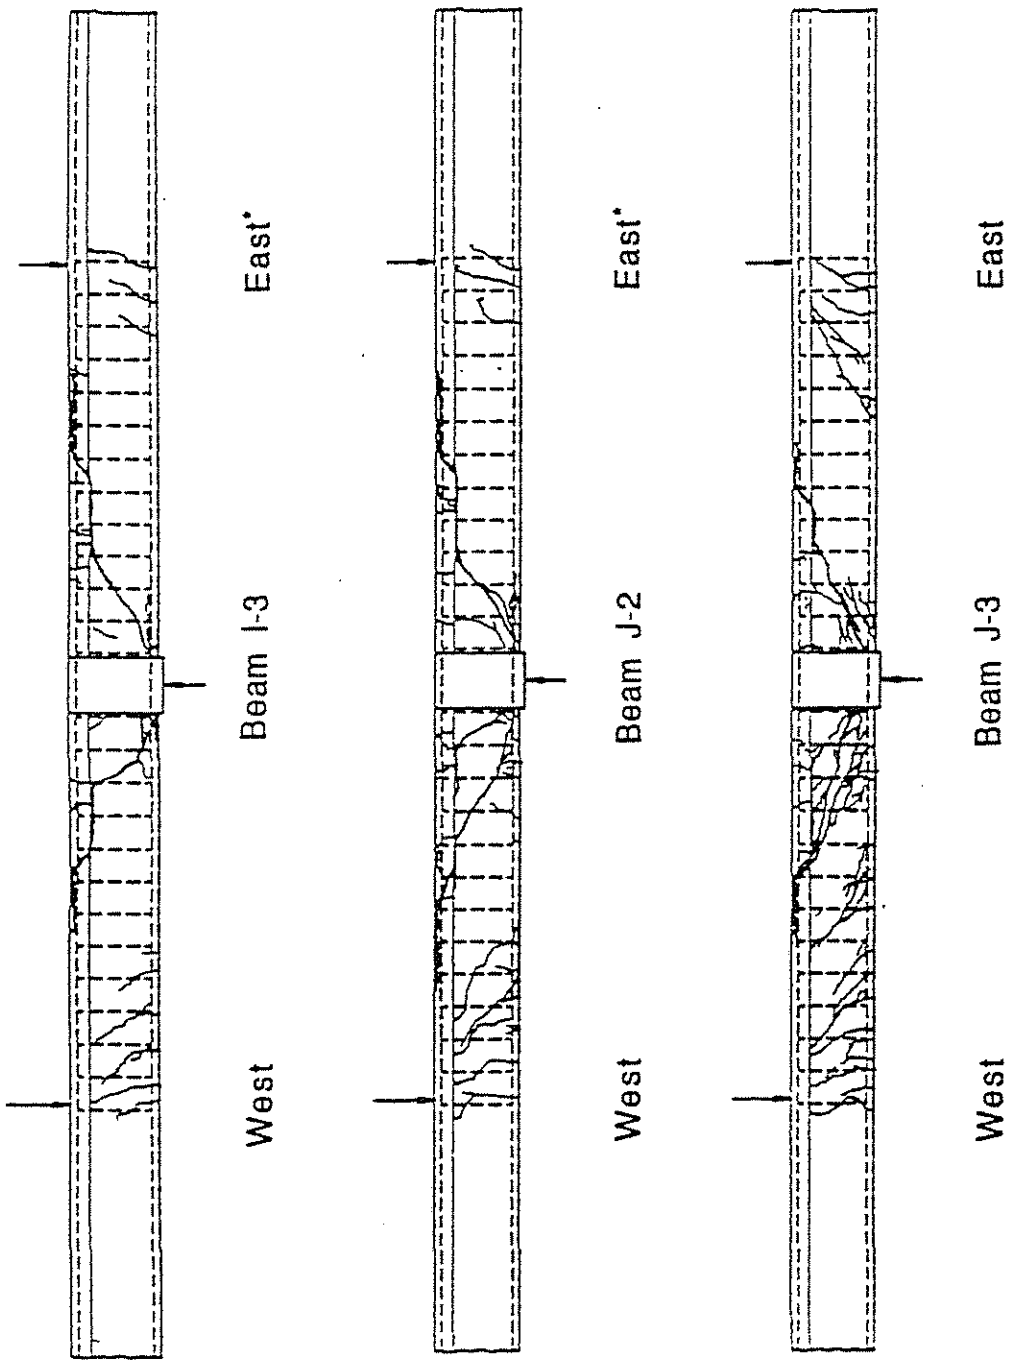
Crack Patterns, Beams I-3, J-2 and J-3 (*indicates span without stirrups).
